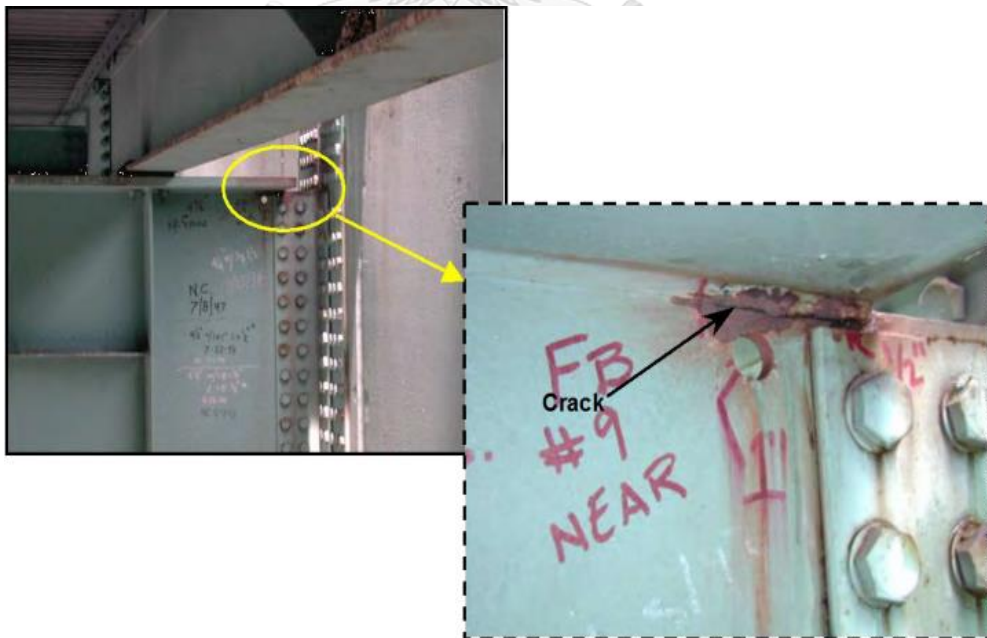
Cracking in the web gap at a tie girder/floor beam connection on Birmingham Bridge in Pittsburgh, Pennsylvania (Dexter and Ocel, 2013).
